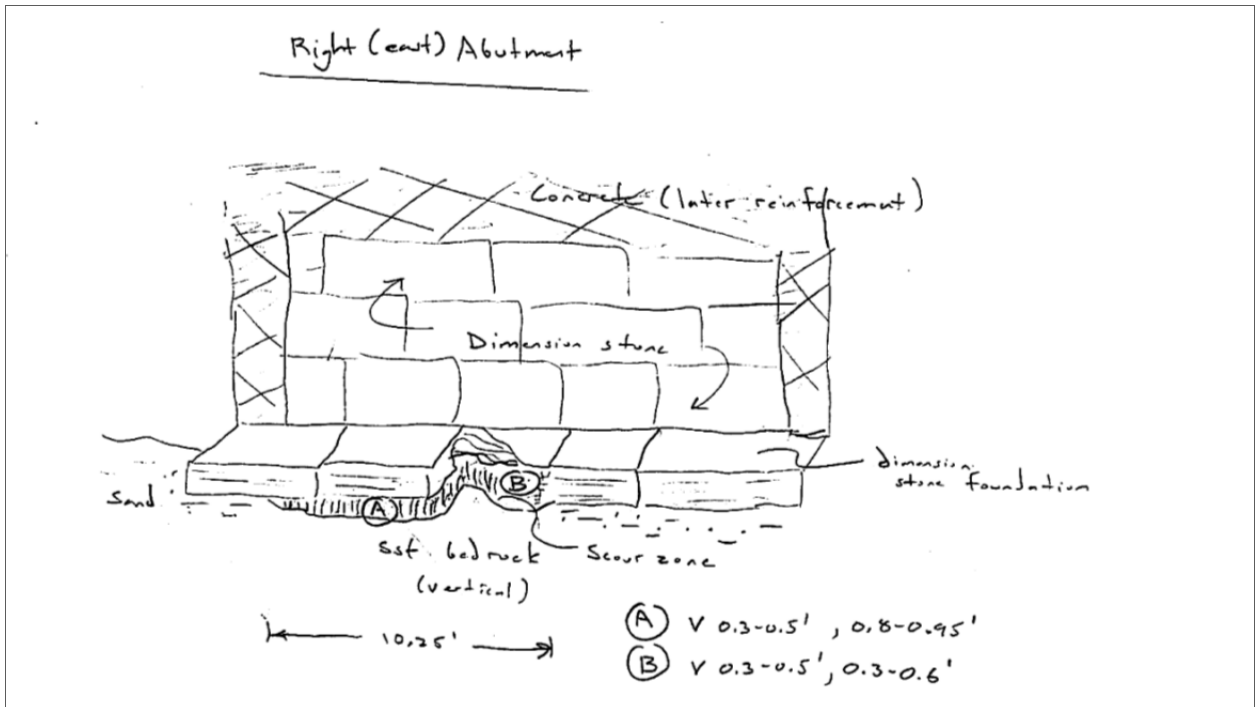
Field sketch of Beverly Bridge, looking at right abutment.
